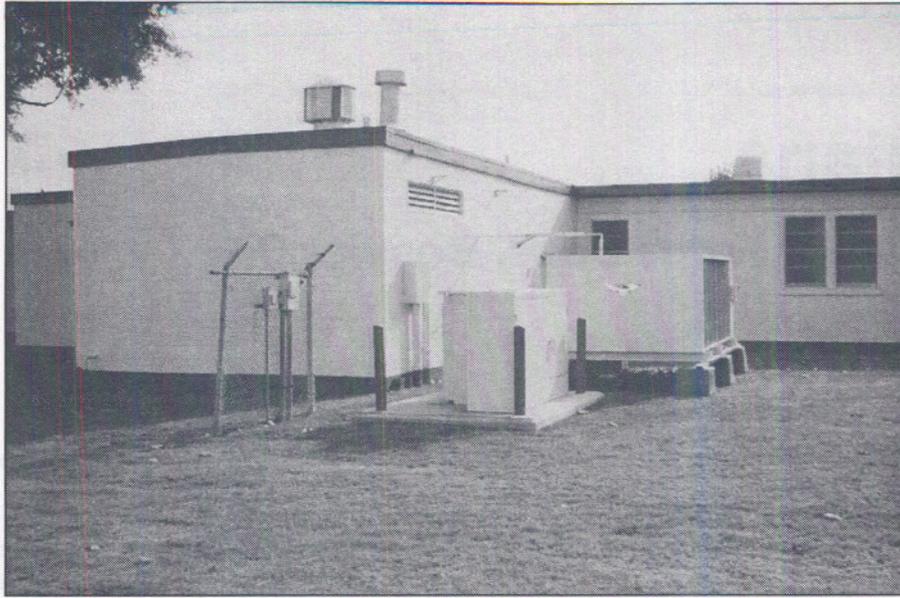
The boiler for Building 5088 is located in a connected, adjacent building.
